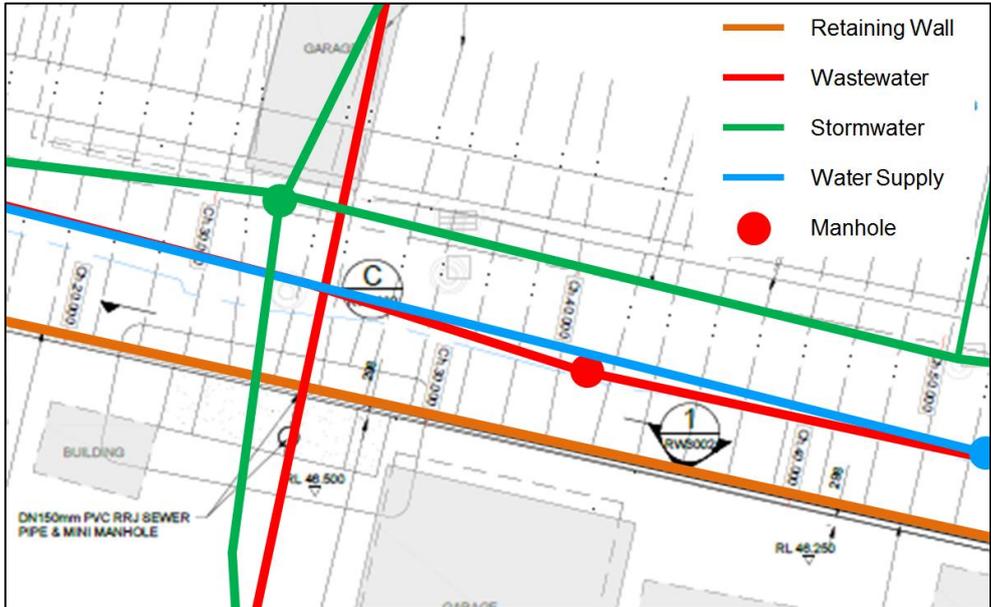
Buried Services adjacent to Cunningham Terrace Retaining Wall
